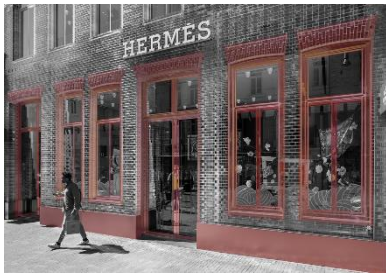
The framing members of the doors and windows are also constructed from glass, with the concrete ram-raised plinth standing out as the only structural element not made of glass.
